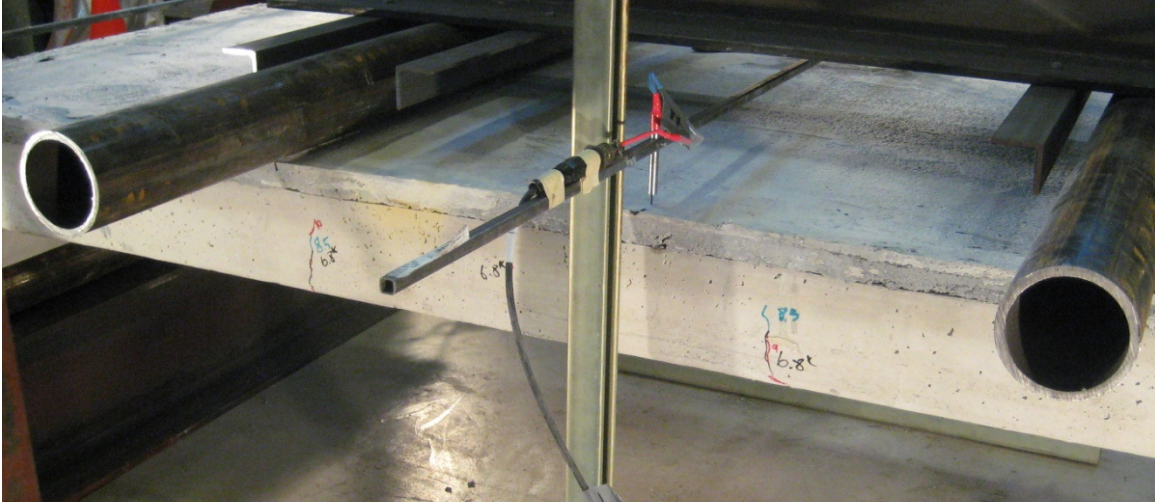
Cracking in the strengthened slab at 10 kips (44.5 kN)
